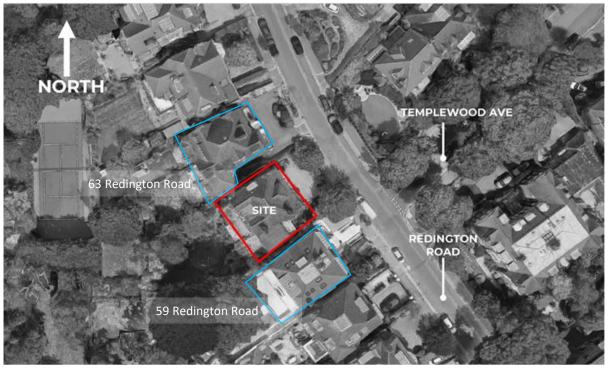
Site plan aerial view with the proposed development (red boundary) and assessed buildings (plan view of assessed buildings highlighted in blue)
